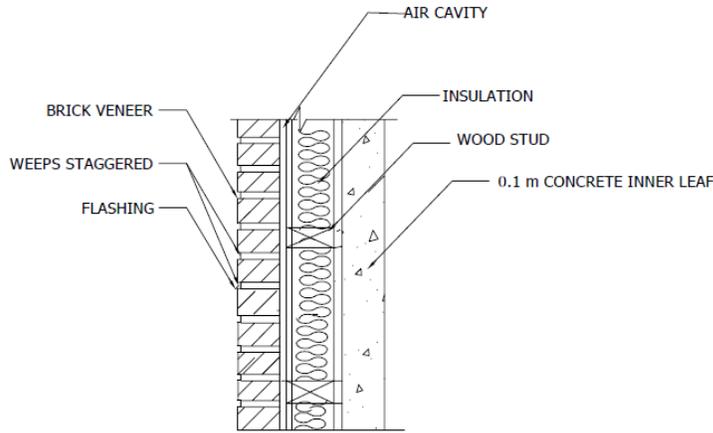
Details of wall assembly with 0.1 m concrete in the inner leaf
